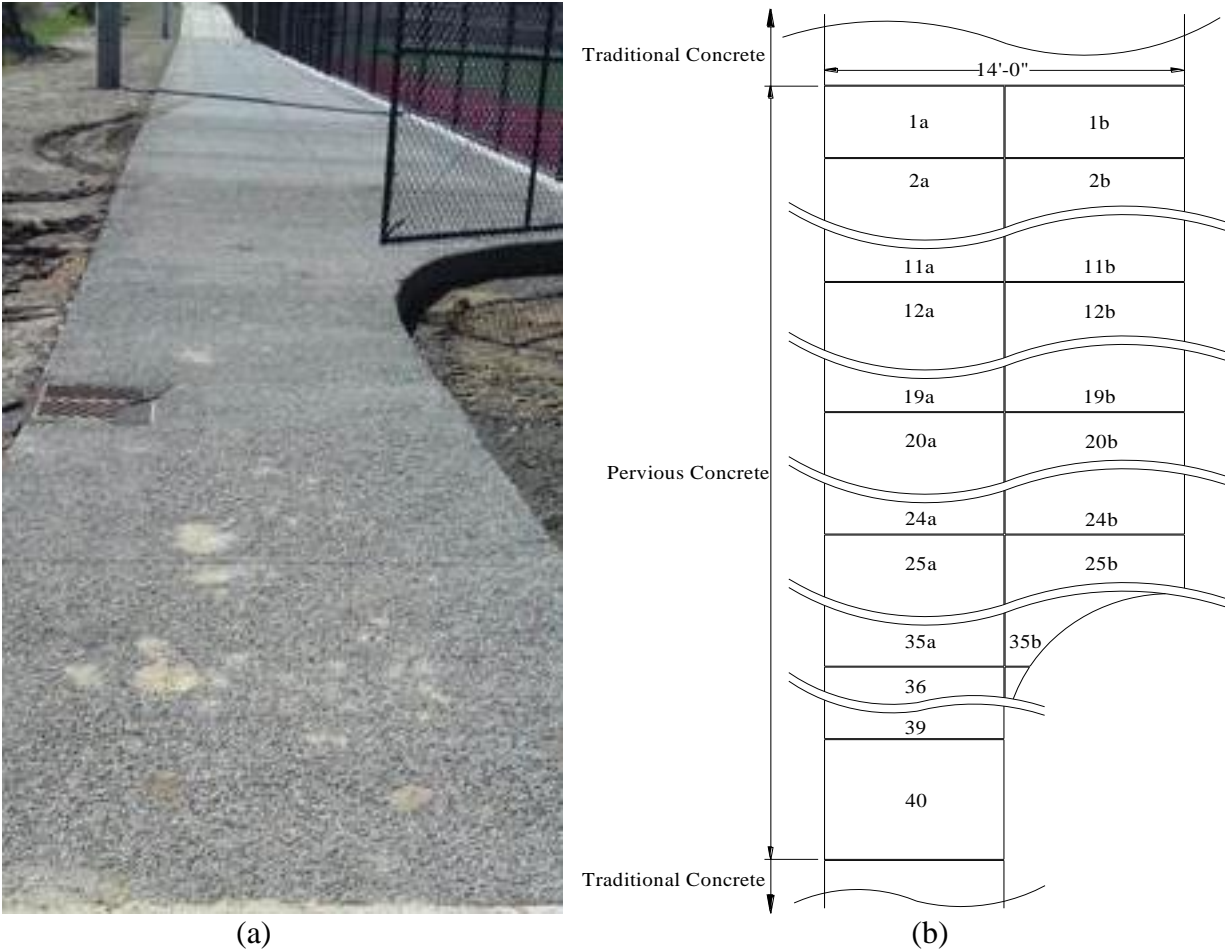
(a) Sidewalk installed at WSU Valley Playfields (eastside); (b) Panel numbering for this pervious concrete sidewalk
